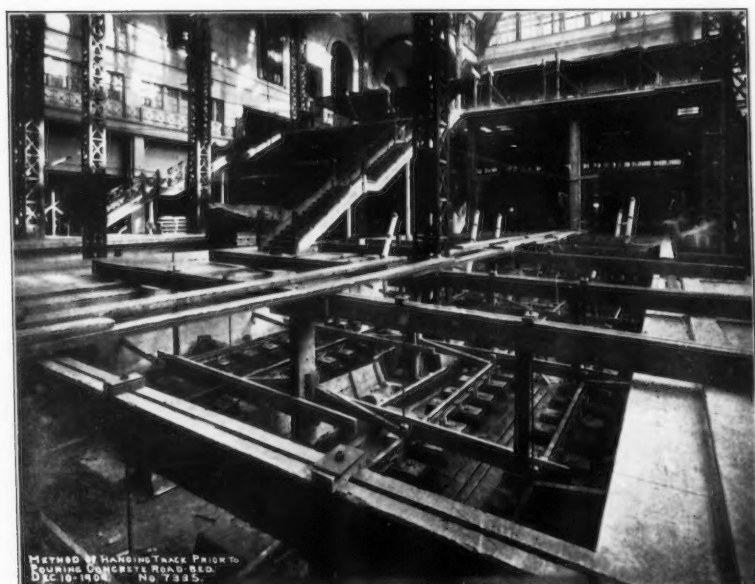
METHOD OF SUPPORTING TRACK STRUCTURE TO RECEIVE CONCRETE BASE.
